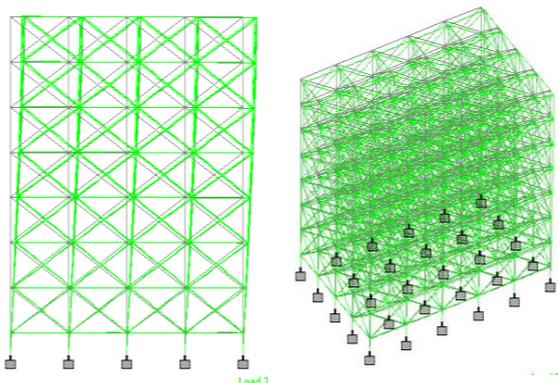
Deflected Shape of Frame with Infill wall Structure in Z- direction
